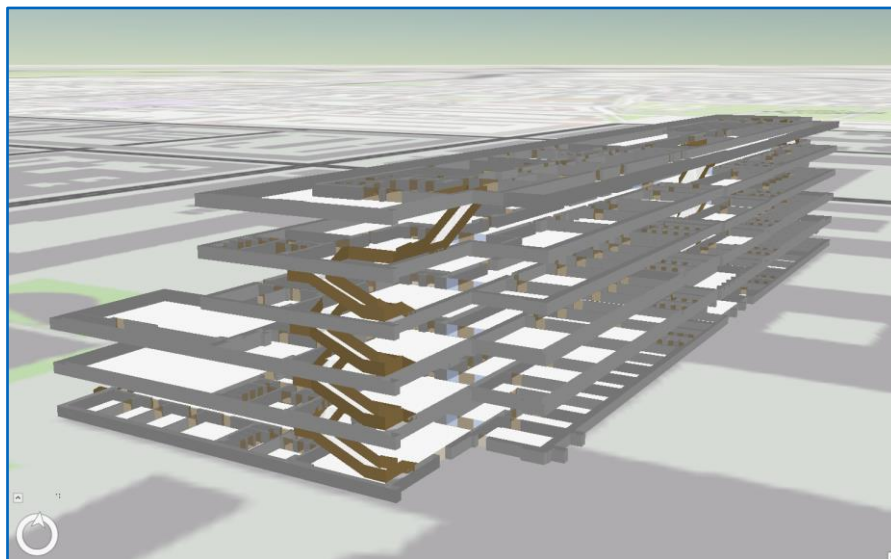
3D visualization and design of the TUM building floorplan lines
